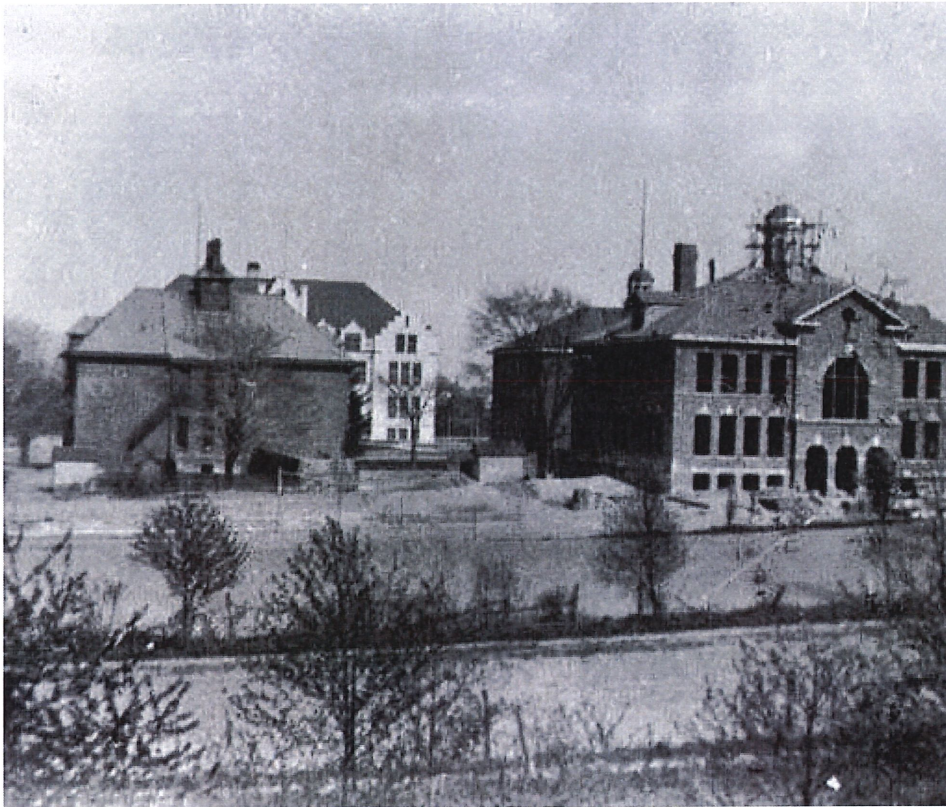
1904 construction photo showing West elevation of East Rockport Central School and Grant School.
